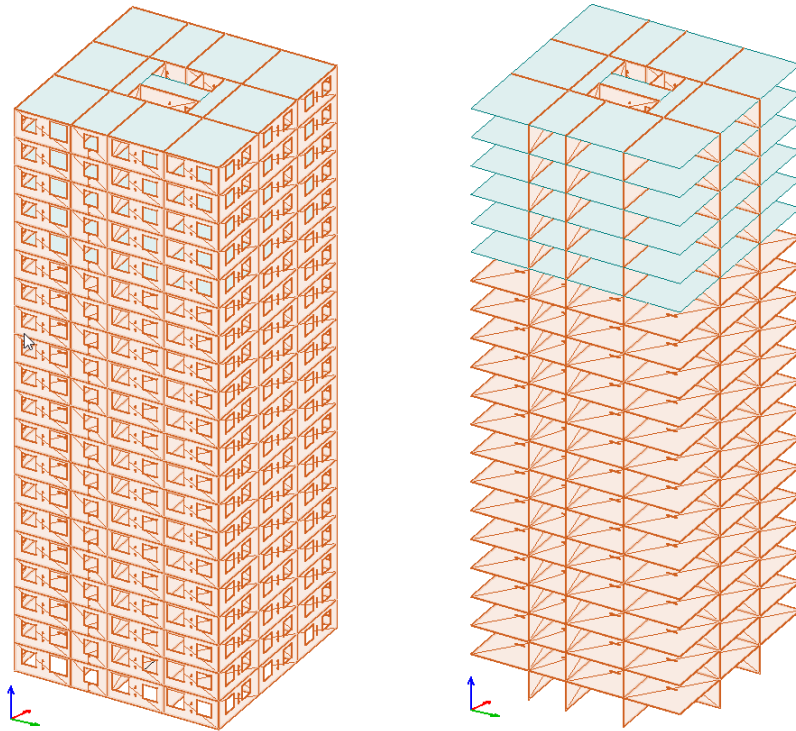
Hybrid timber building with concrete slabs on the top floors.
